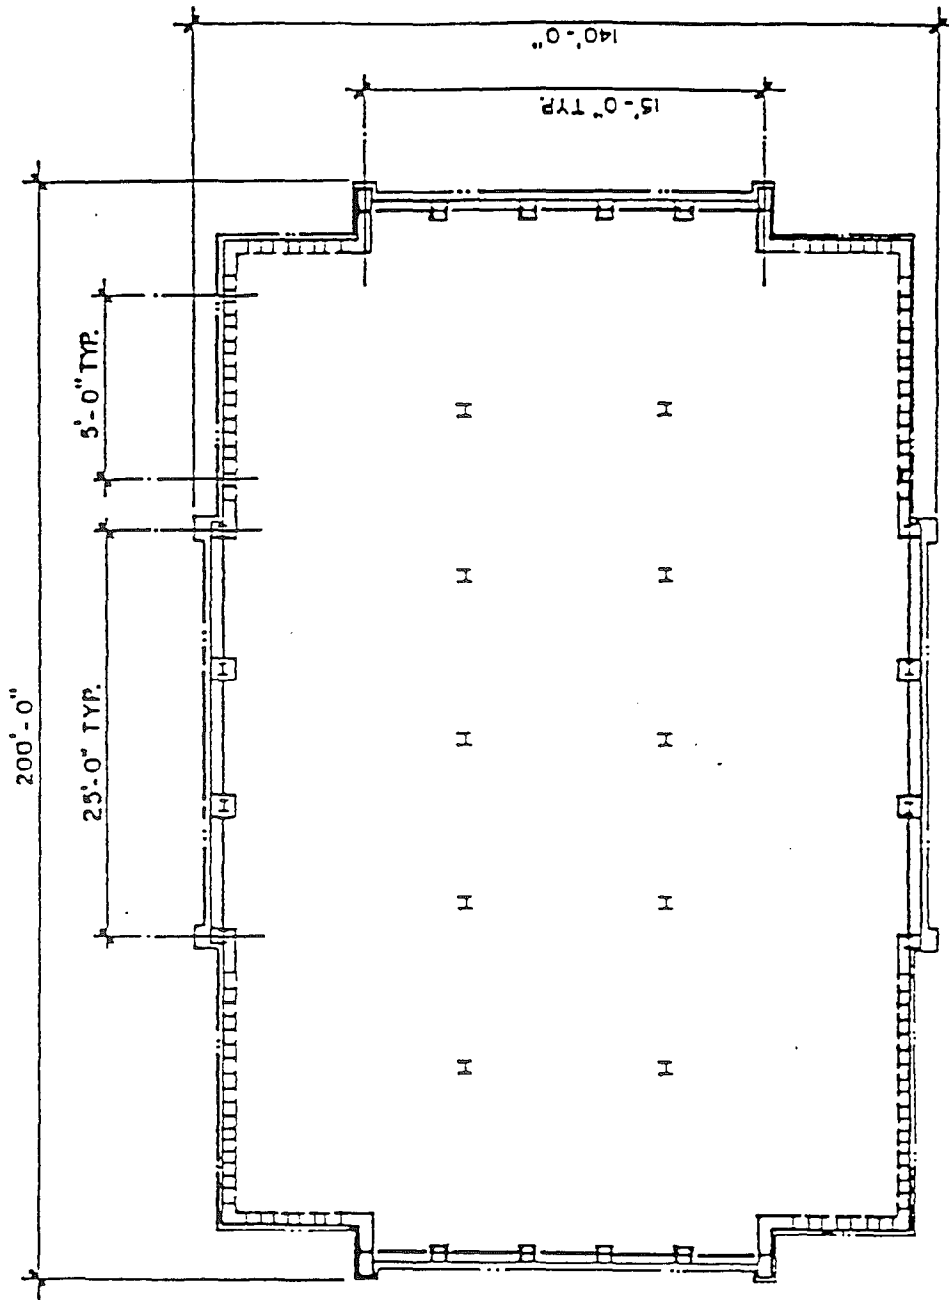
Momentum Place, System D-Punched Concrete Walls at Building
